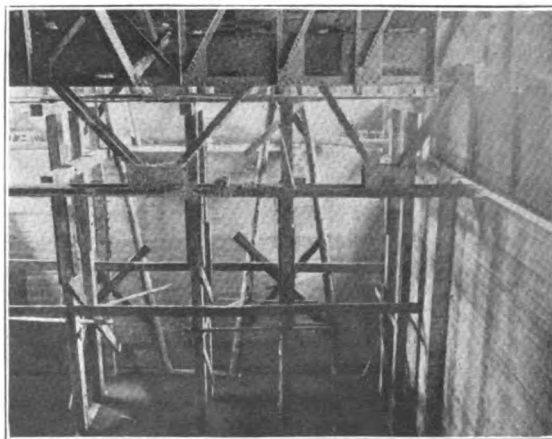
Completed Tail Pit. Temporary Steel Truss Resting on Longitudinal Girders Supports Approach Pavement.
